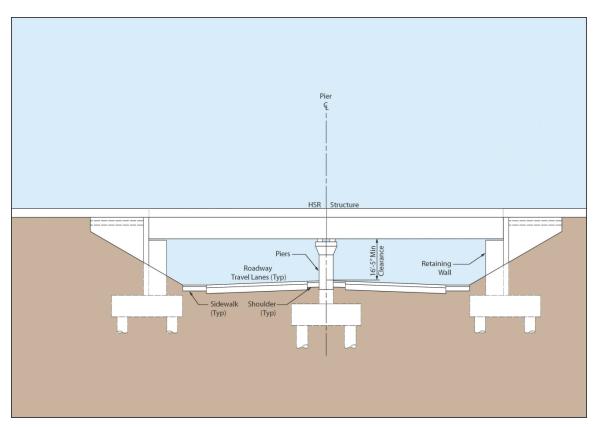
Typical Cross Section of Roadway Grade-Separated Beneath High-Speed Rail Guideway
